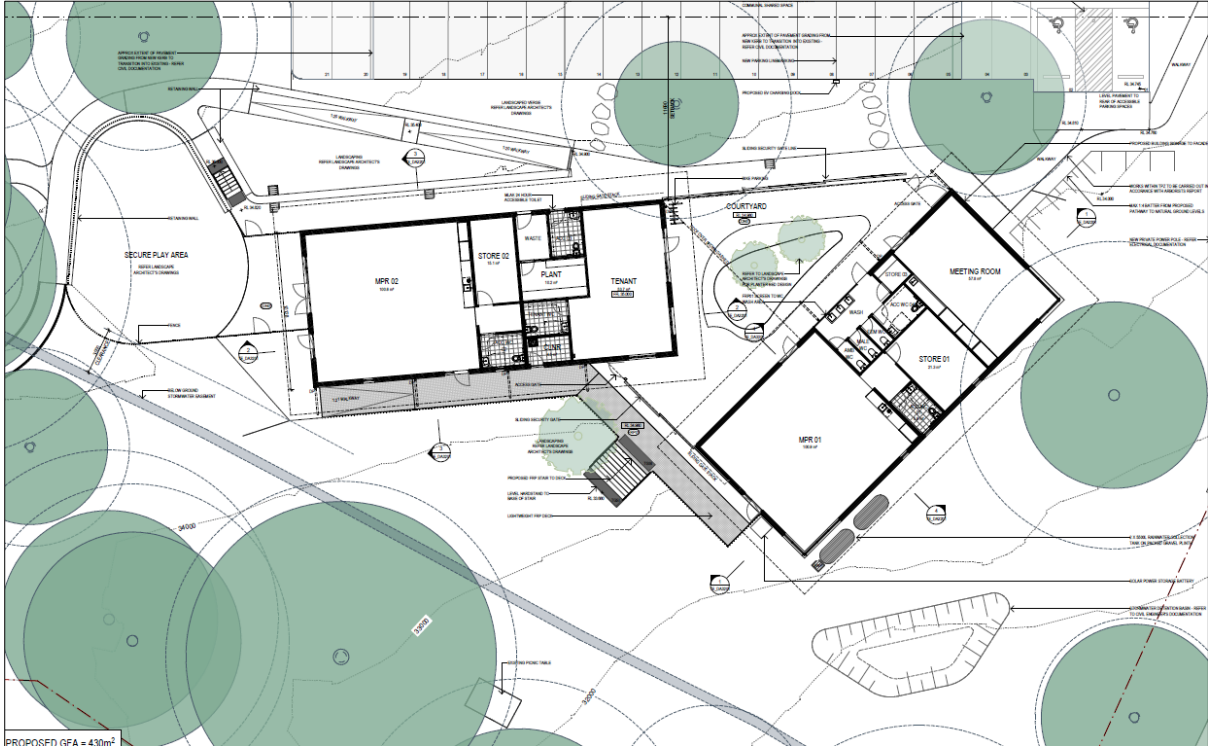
Ground floor layout. Source: AJC Architects (April 2024)
